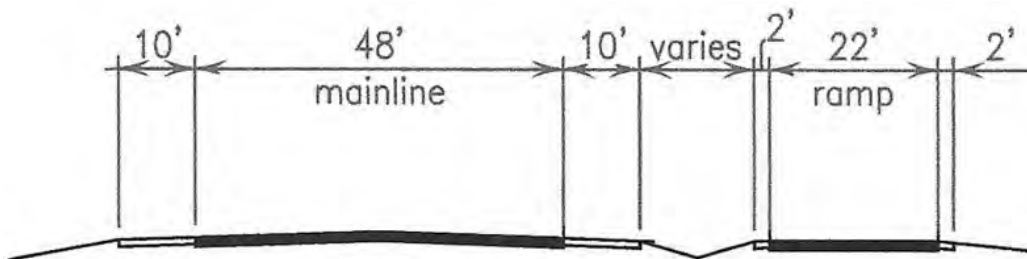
Cross-section view of approach roadway for a mainline and a ramp that are carried across one structure (Example 2)
